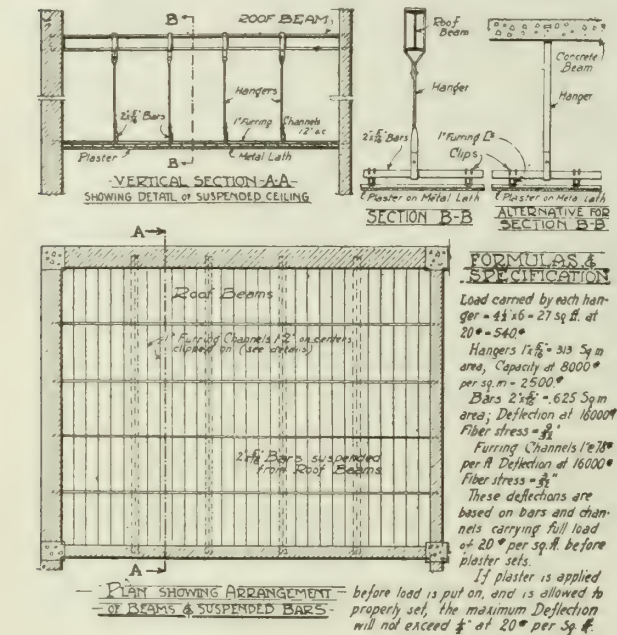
SUSPENDED CEILING CONSTRUCTION
